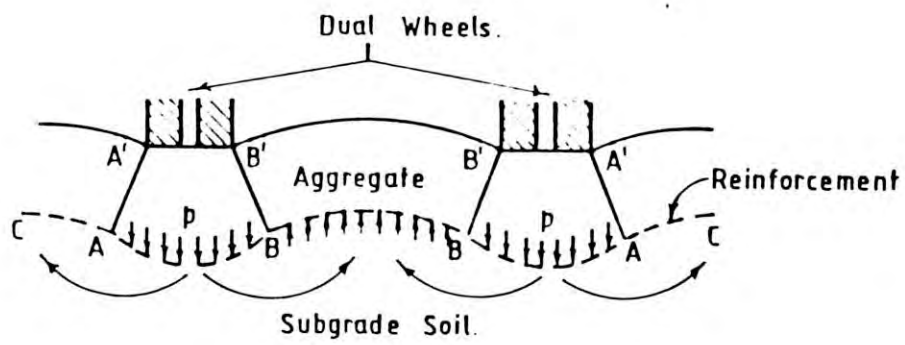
Deformed Shape of Reinforcement and Equilibrium
